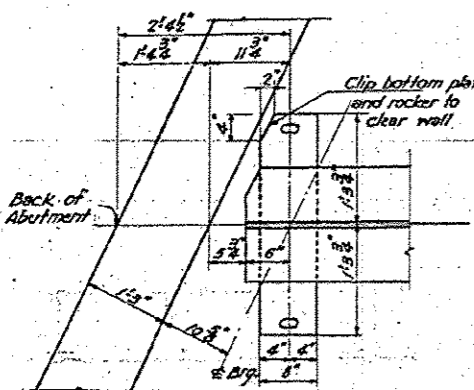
DETAIL OF EXPANSION BEARING AT ABUTMENTS & PIERS 3&6
